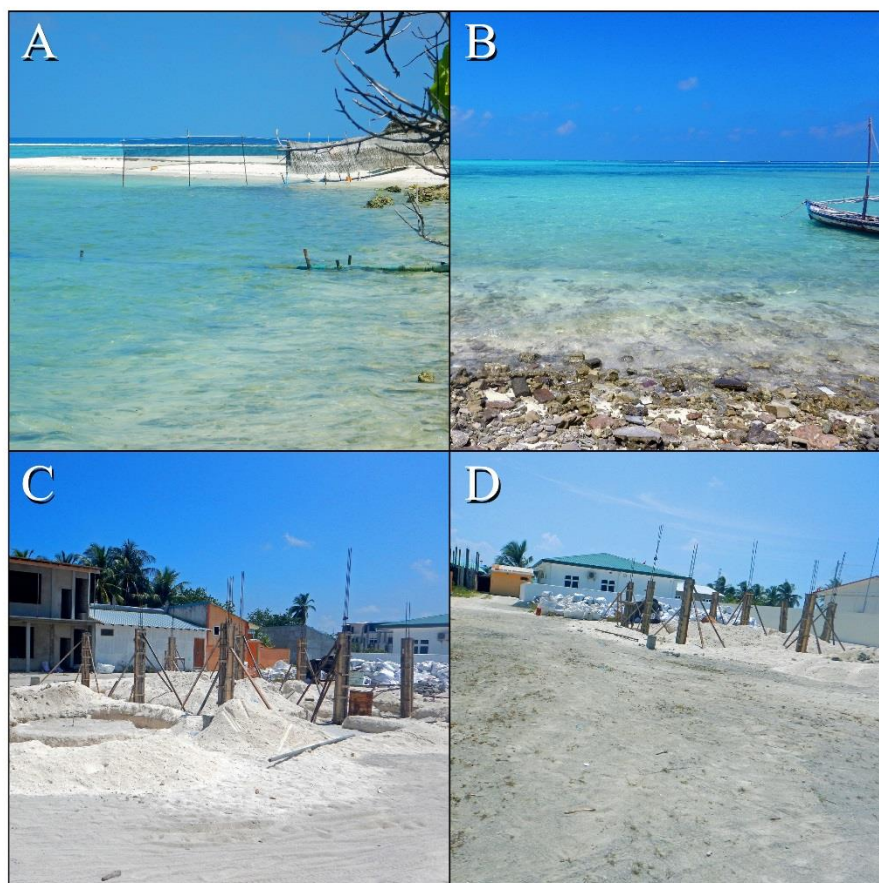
Photo profile of proposed location K. Gaafaru (A)(B) Outfall location (C)(D) RO plant site
